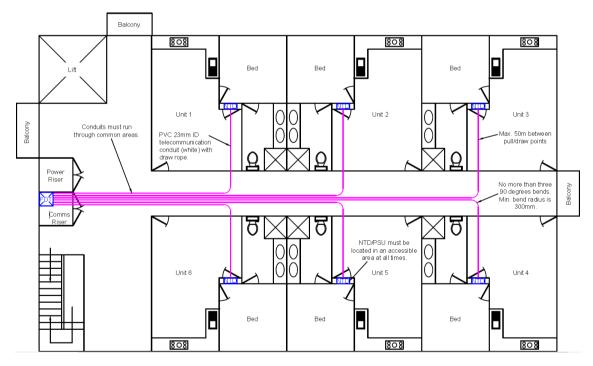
nbn™ pathway using all nominal P20 conduit to feed typical apartment floor (example layout 1)
